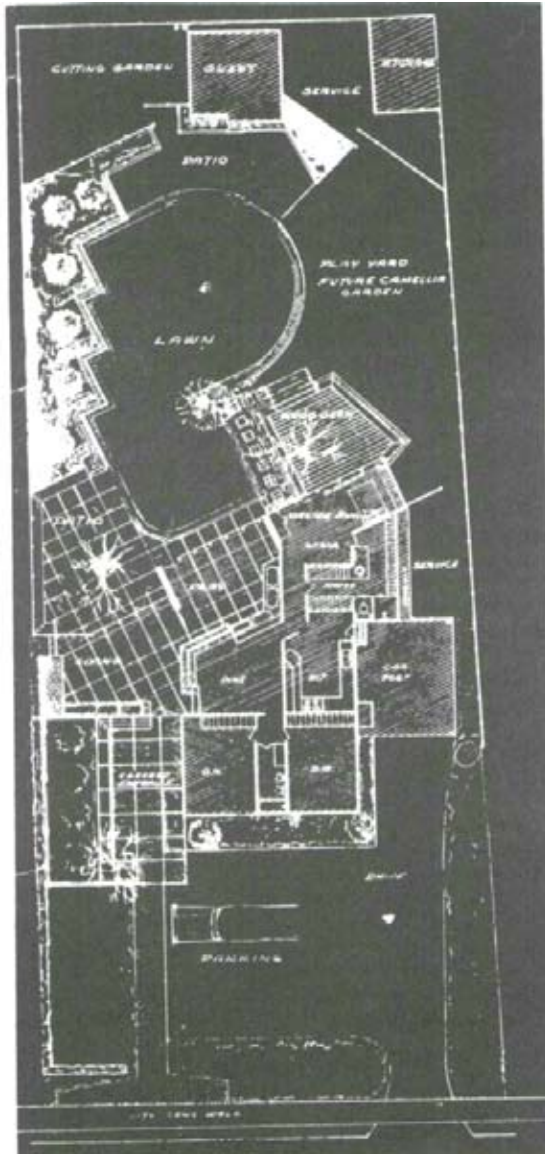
Walterboro house plan. (Image Robert E. Marvin)
